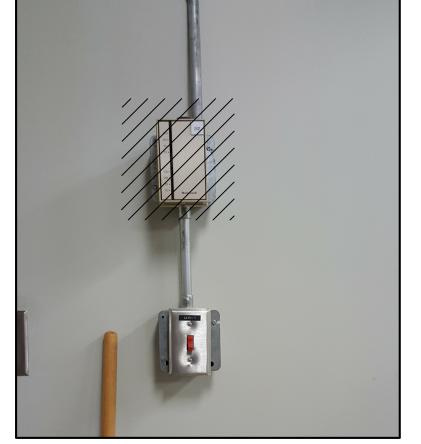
EXISTING UNIT HEATER THERMOSTAT TO BE REMOVED — MECHANICAL ROOM 205.
